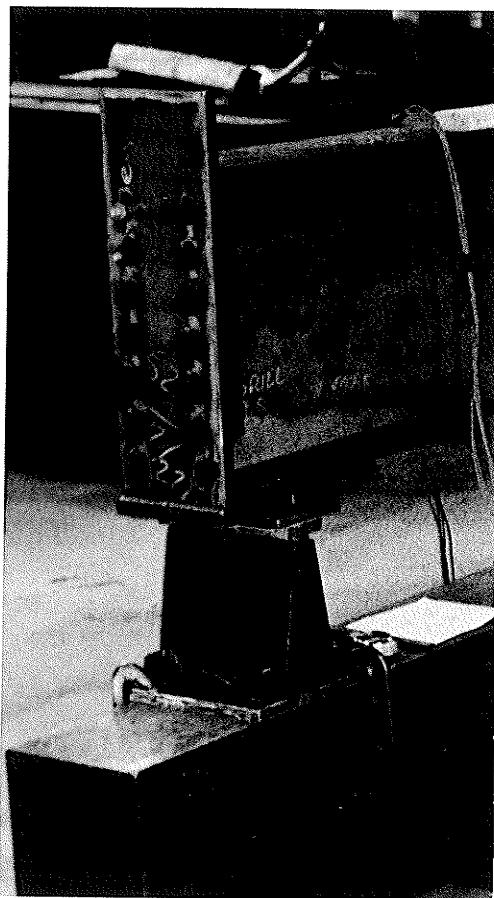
Welded-Plate Angle Fastened to the End of the Beam Segment.
